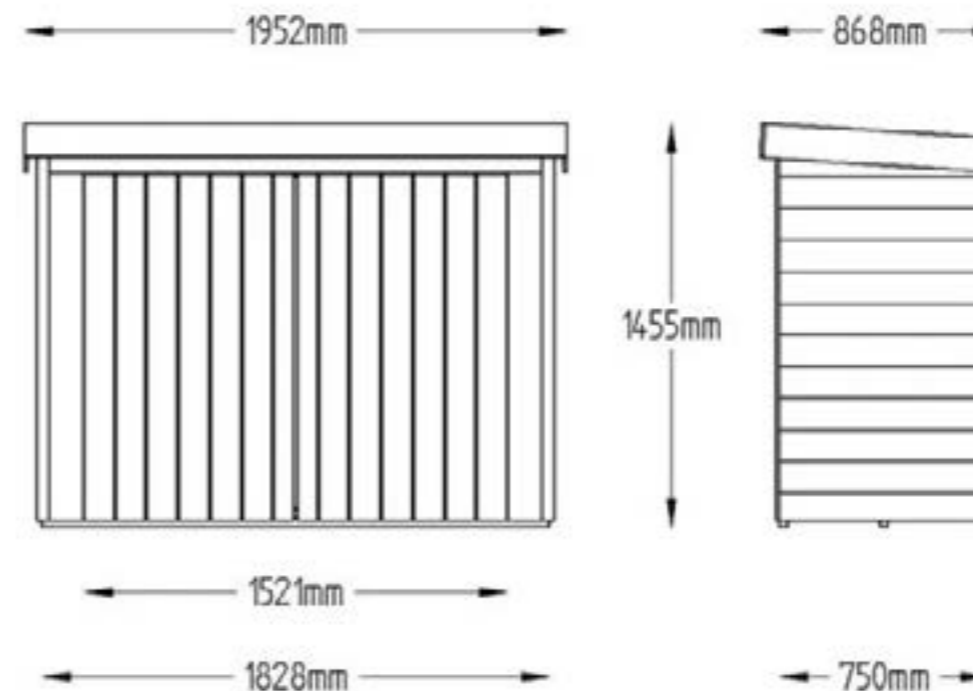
Cycle Parking Front and Side Elevation - Scale 1:50 @ A3
